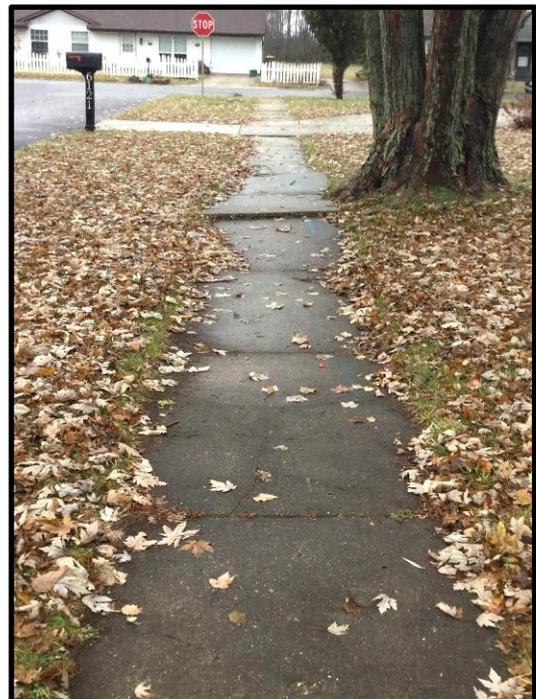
, Sidewalk Conditions in the Harrison Meadows Subdivision
